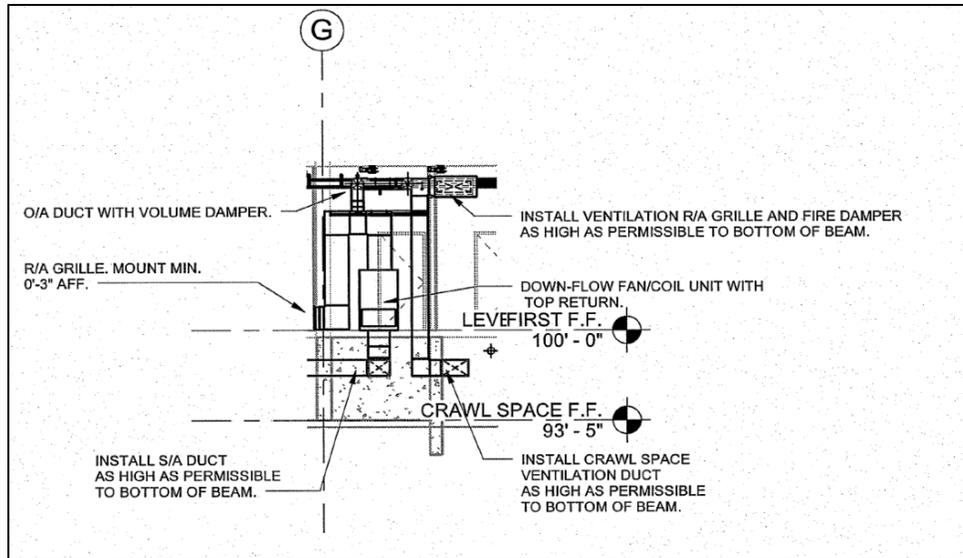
Figure II. Elevation of Francis Hall AHU serving the first floor entry of the building.
